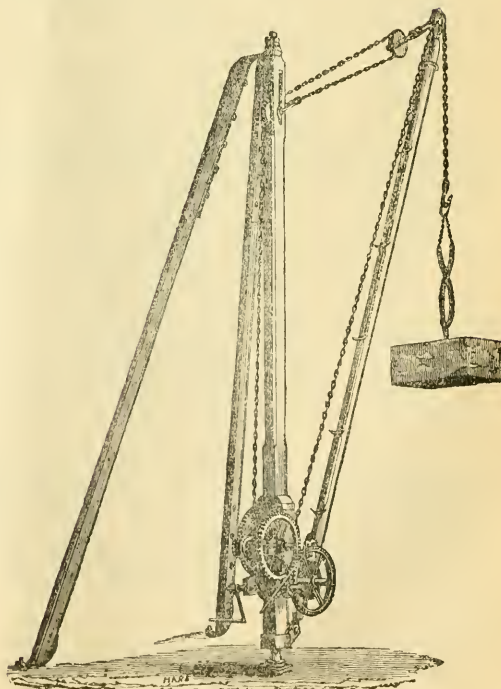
Derrick crane used at Granton Pier (Edinburgh.)
